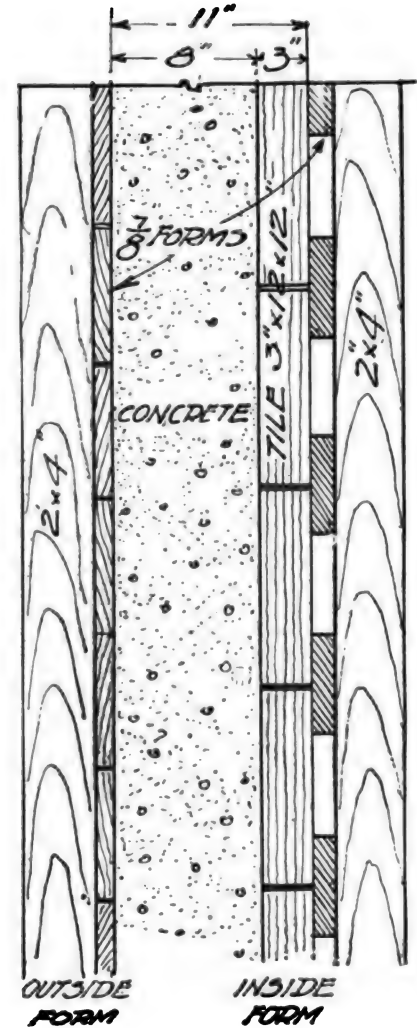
DETAIL (at right) SHOWING METHOD OF WALL CONSTRUCTION
